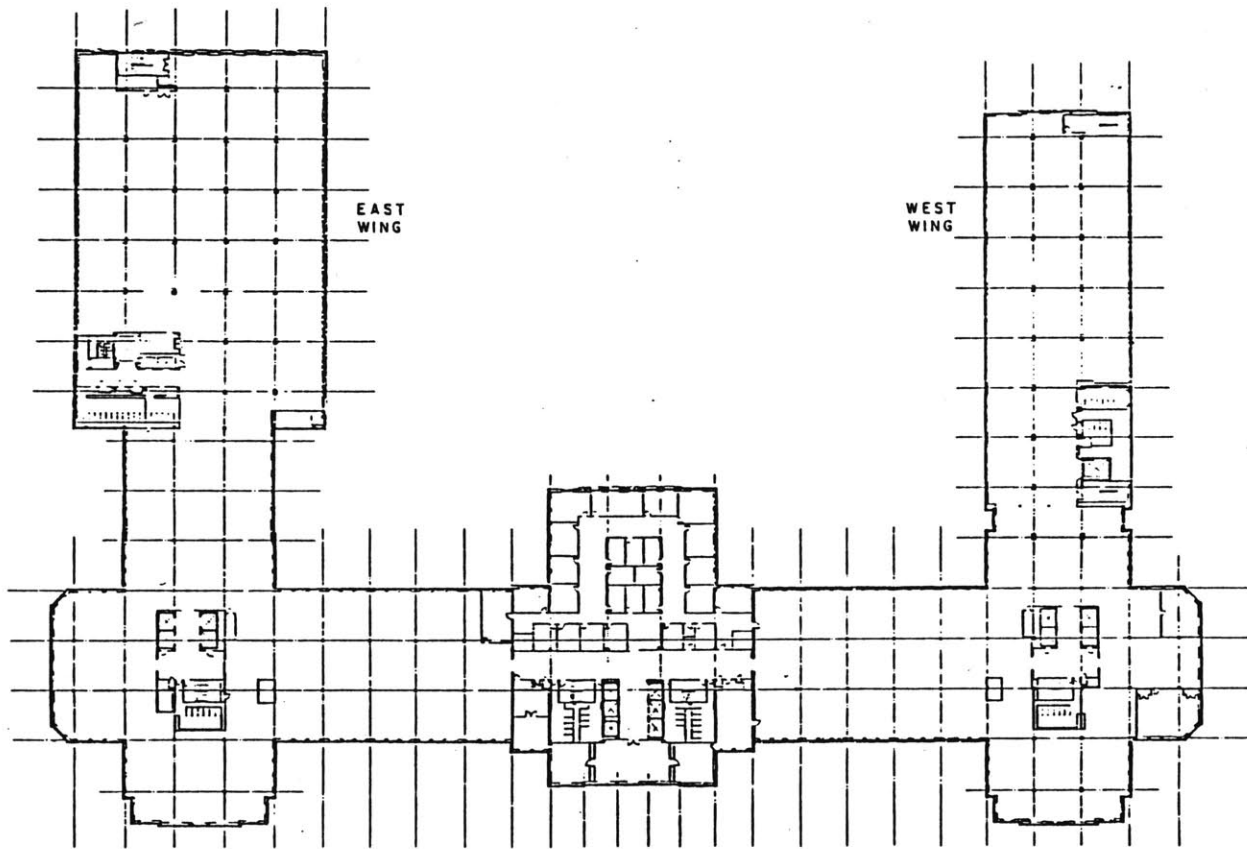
PLAN FOURTH FLOOR OF MAIN BUILDING
